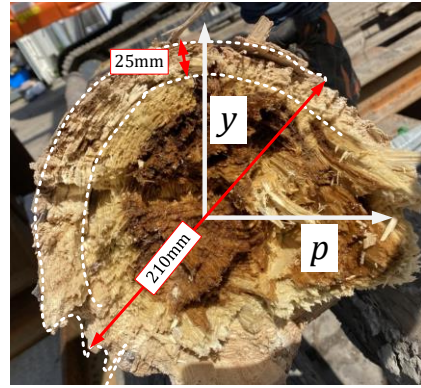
, Photograph of bending failure cross section of pile 3. Softshell can be identified by colour and structure of the timber fibres. Shell in positive y -direction is estimated to be 25mm by visual inspection.
